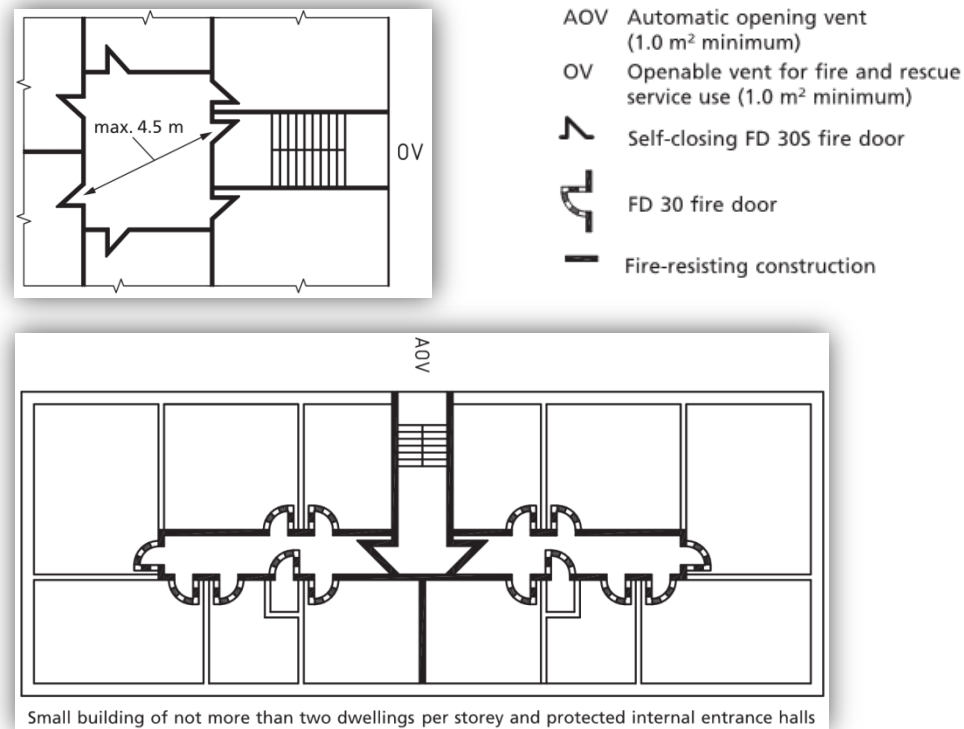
small single stair buildings (Source: BS9991 Figure 8)
